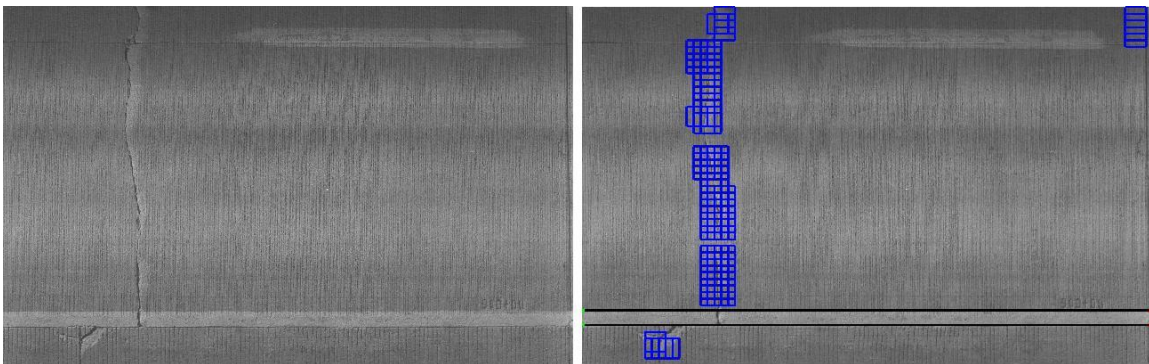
Example 2 of concrete crack at high severity: raw crack (left) and crack detection (right)
